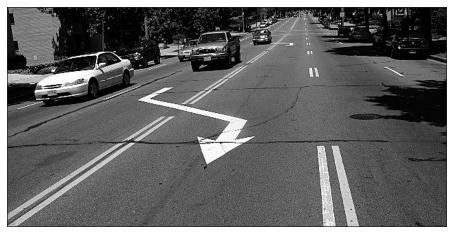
Reversible lane entry pavement markings on Connecticut Avenue in Washington, DC.
